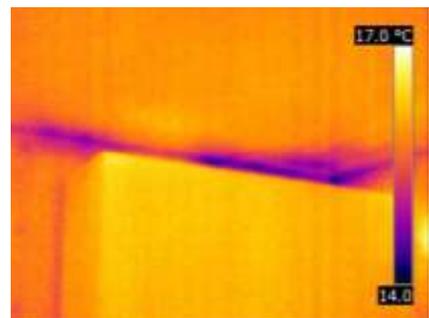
IR image internal wall and ceiling junction of plot 19 in kitchen above wall cabinets showing heat loss through uncontrolled air infiltration or thermal bridging.
